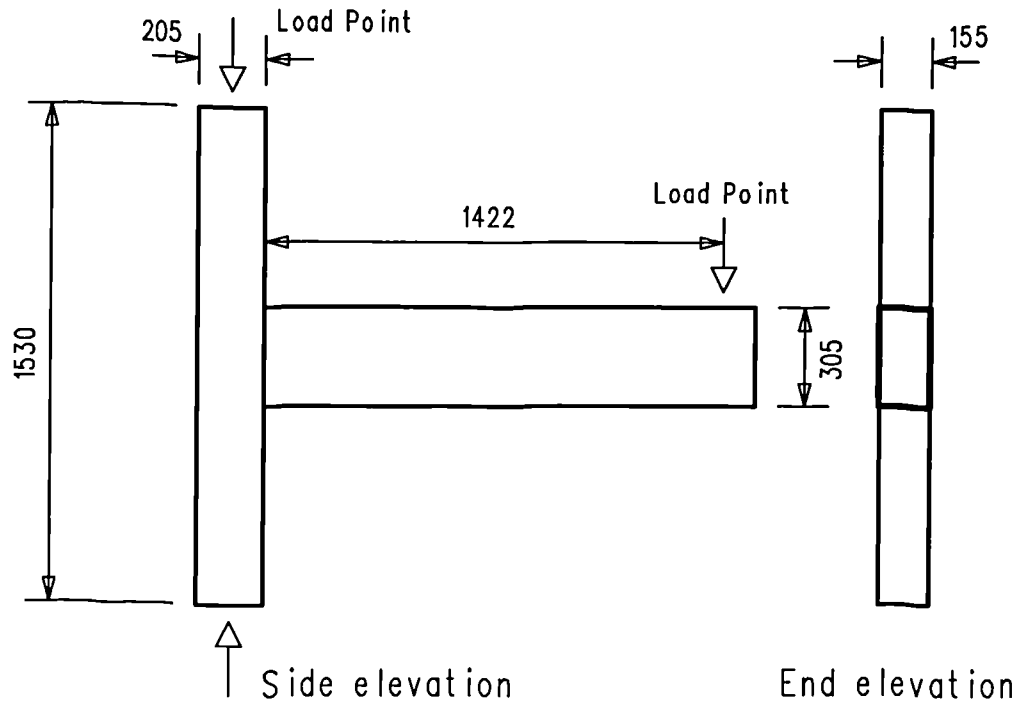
Specimen layout (dimensions in mm) - Sarsam [7]
